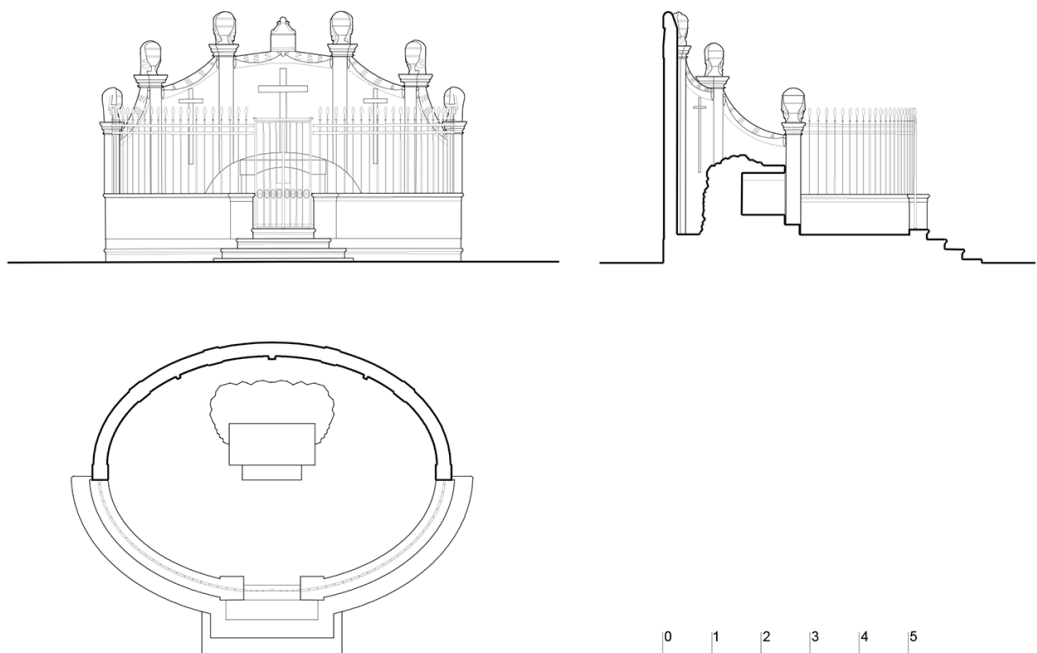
Calvario of Melpignano. Elevation, plan and section: H 5,11m x L 7,40m x P 6,40m.
